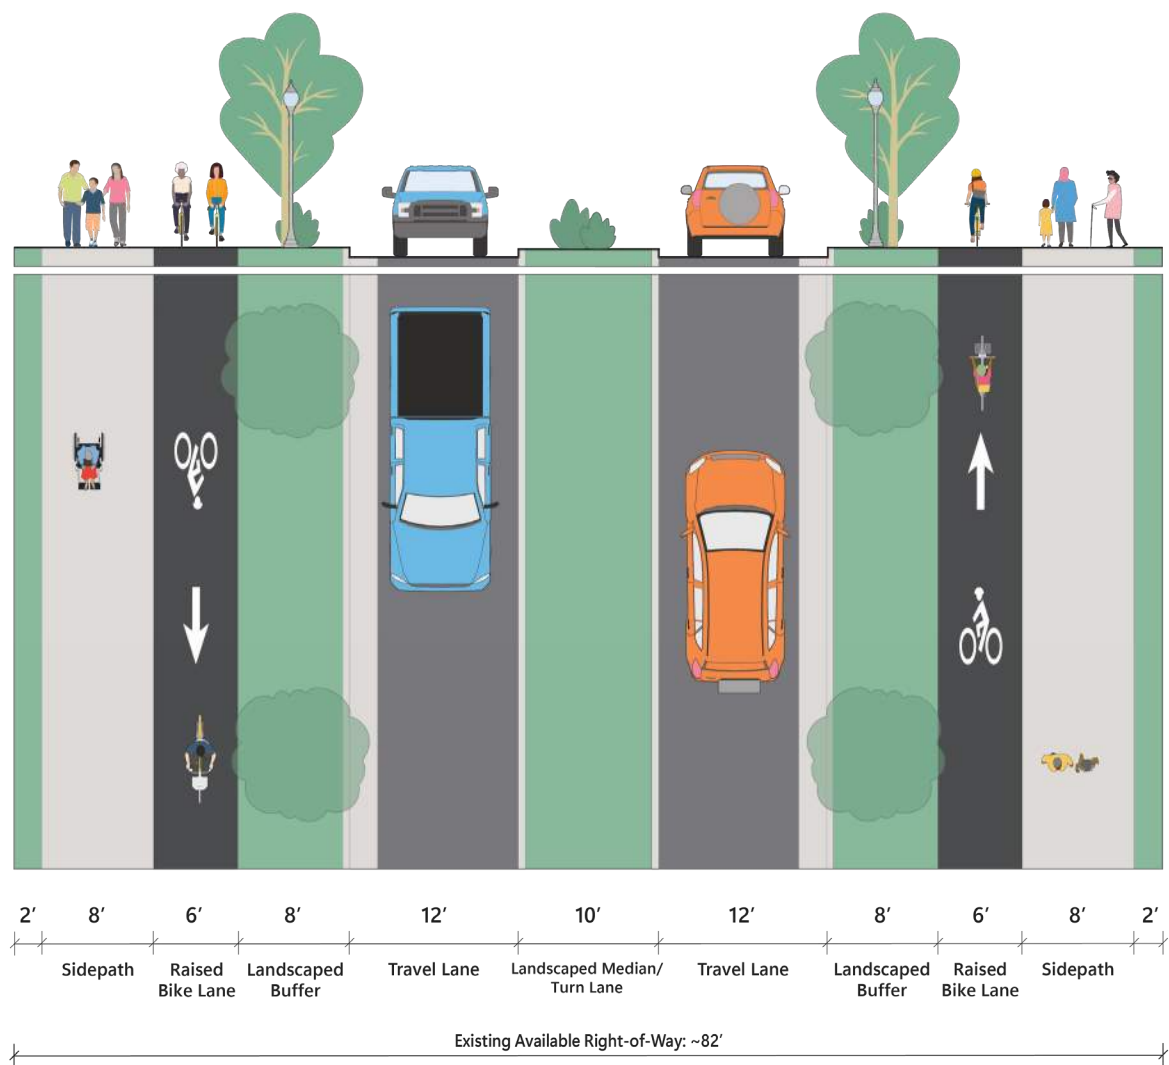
Pecos Street Option A typical cross-section (looking north)
